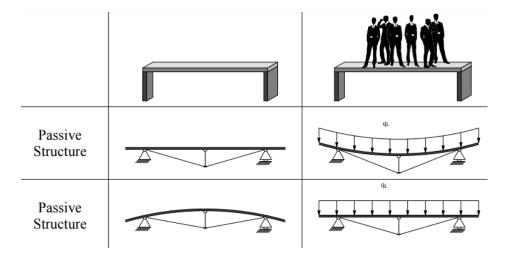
Deflection of passive structure, Rooyackers [18].
